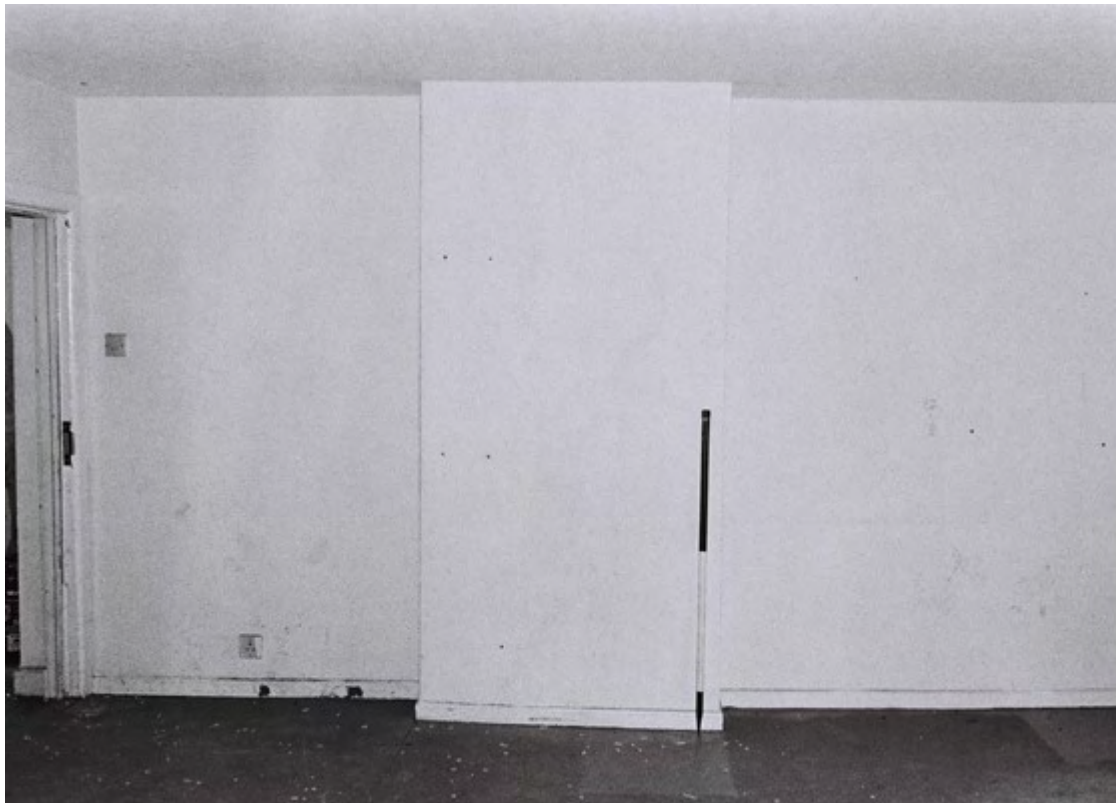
Marsden Park Cottage Interior. First Floor. Facing West.
